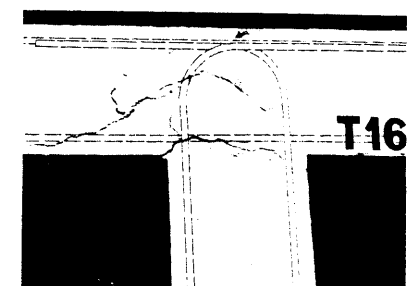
Specimen T16 after Bending Failure in Column Close to Slab
